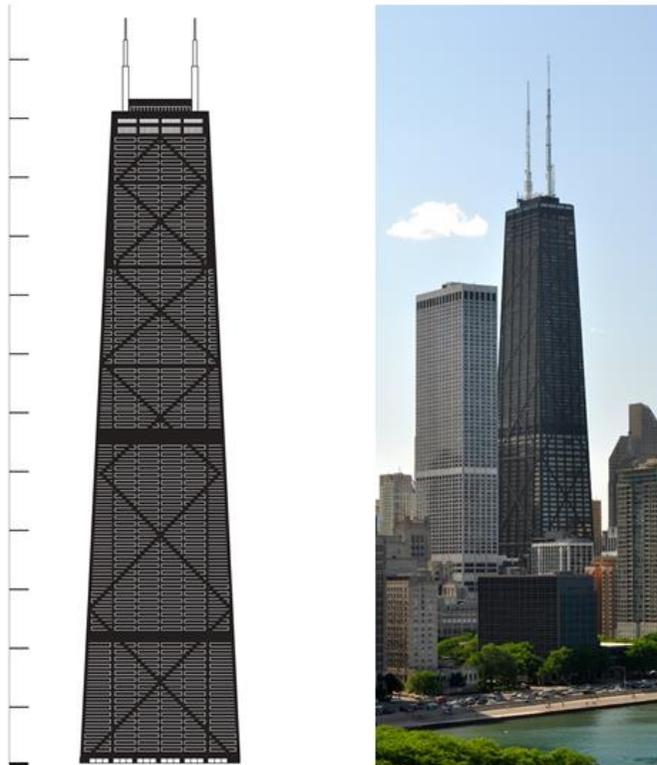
John Hancock Building - Elevation (left) and in Urban Context (right)
